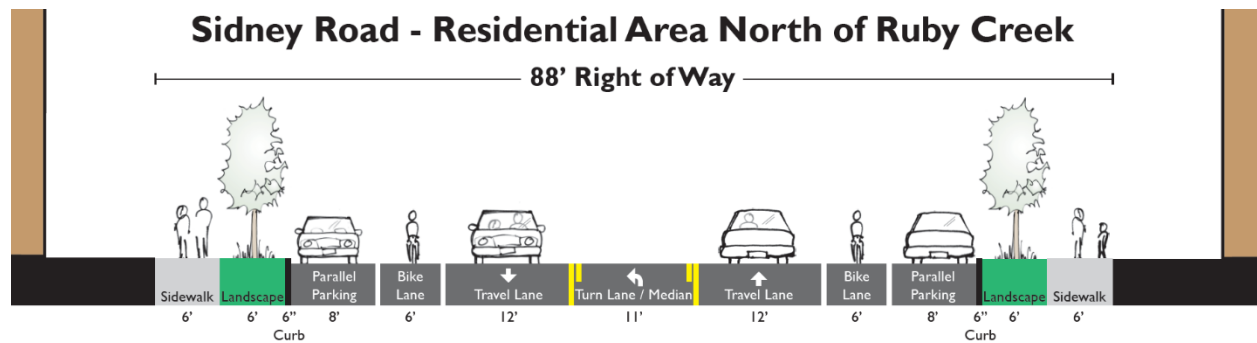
Sidney Road SW. This road section would be used in the center to the north of the Ruby Creek crossing.
